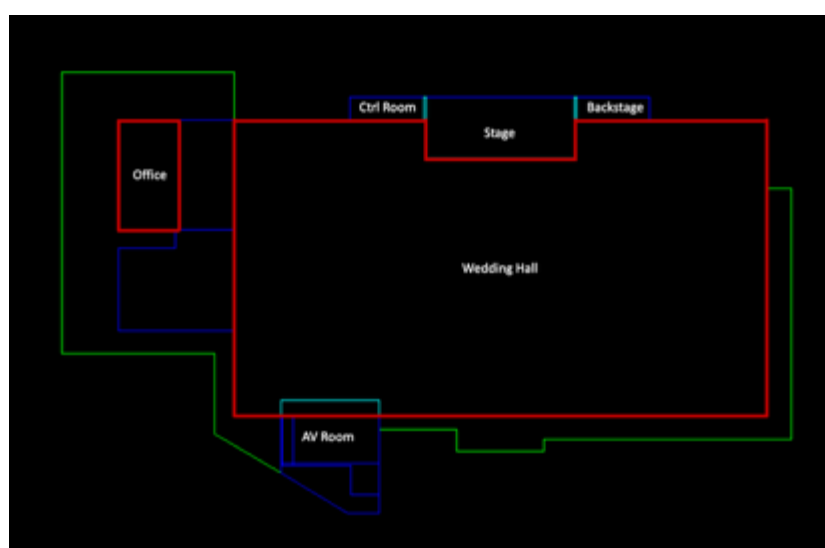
Floor plan for the wedding hall with the simulated areas highlighted
